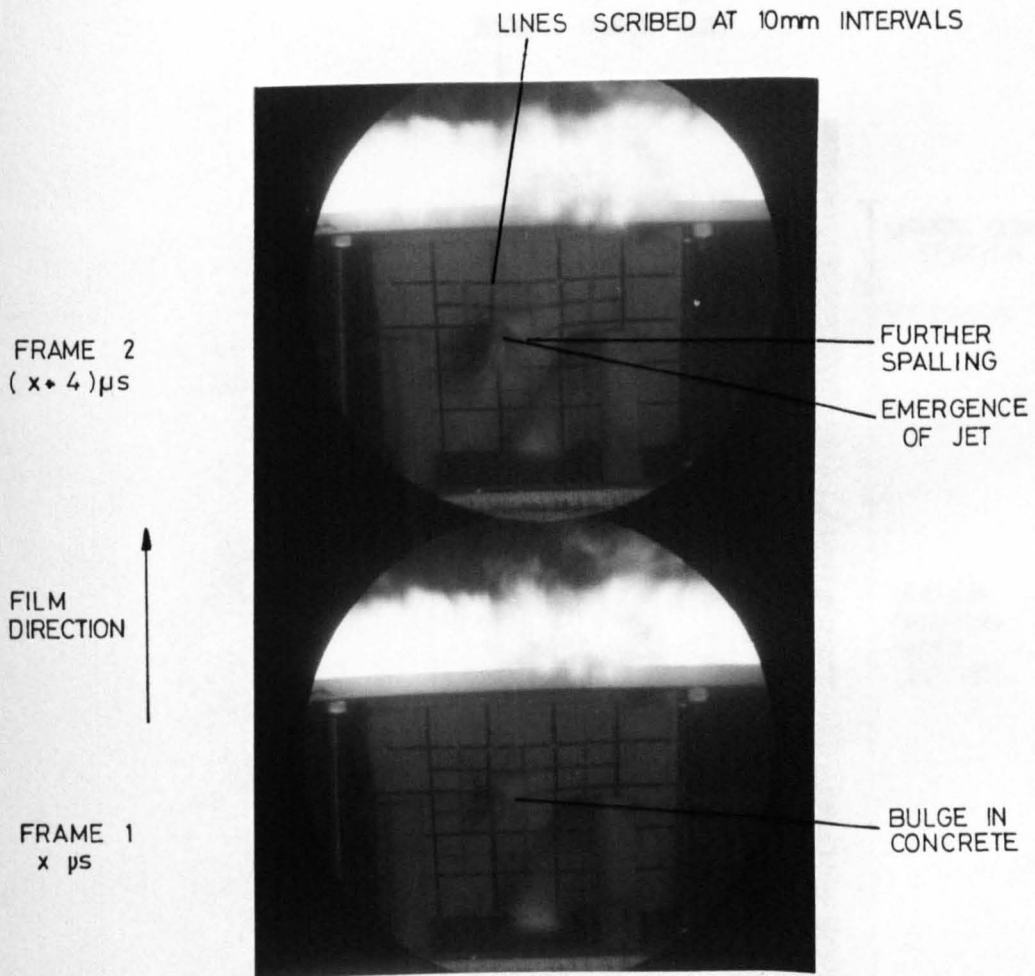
SPALLING AND CONCRETE MOVEMENT DURING SHAPED CHARGE JET PENETRATION
